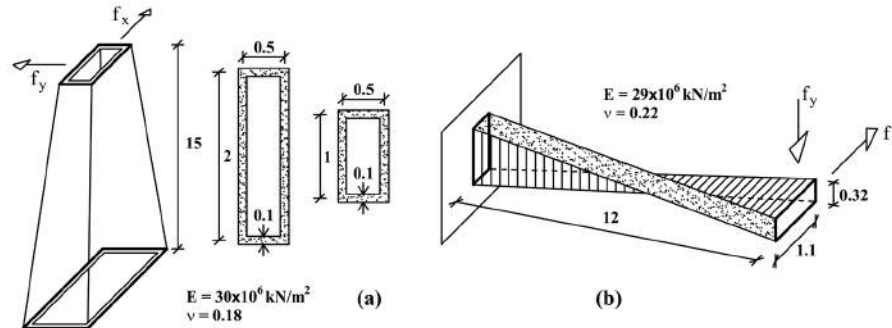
Tapered hollow (a) and twisted double symmetrical (b) section cantilever.
